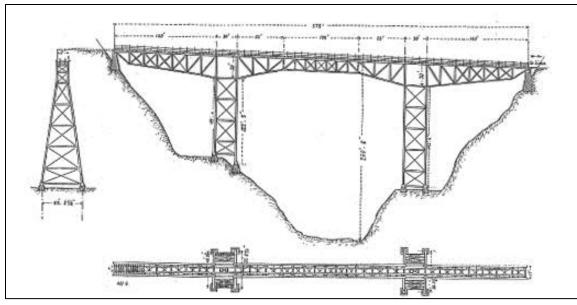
, Plan, elevation and transverse view of new Verrugas Viaduct.
